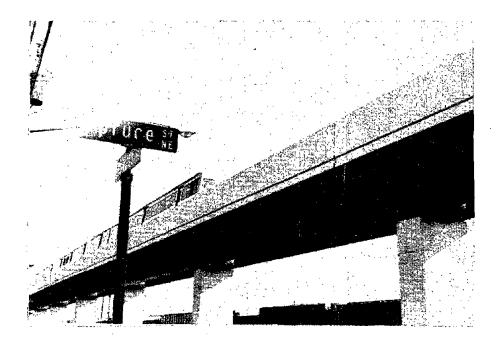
MARTA ELEVATED STRUCTURE WITH STEEL BOX BEAM AND NOISE BARRIER
